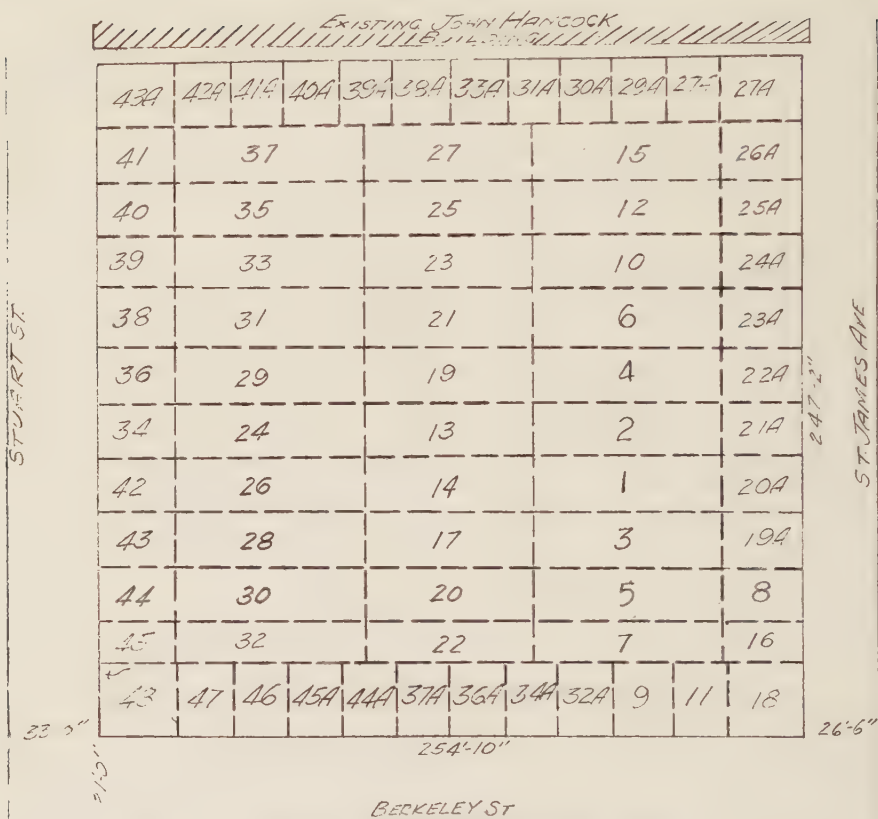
PLAN OF FOUNDATION SLAB SHOWING PROPOSED CONSTRUCTION SEQUENCE.
